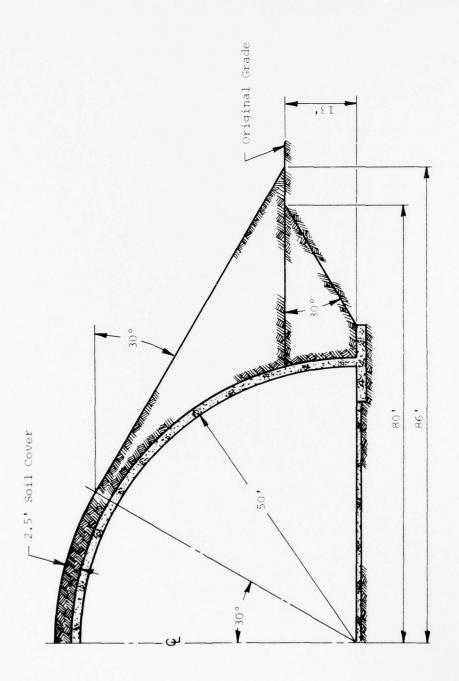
Balanced Cut and Fill Condition for 100-Foot Span Arch
